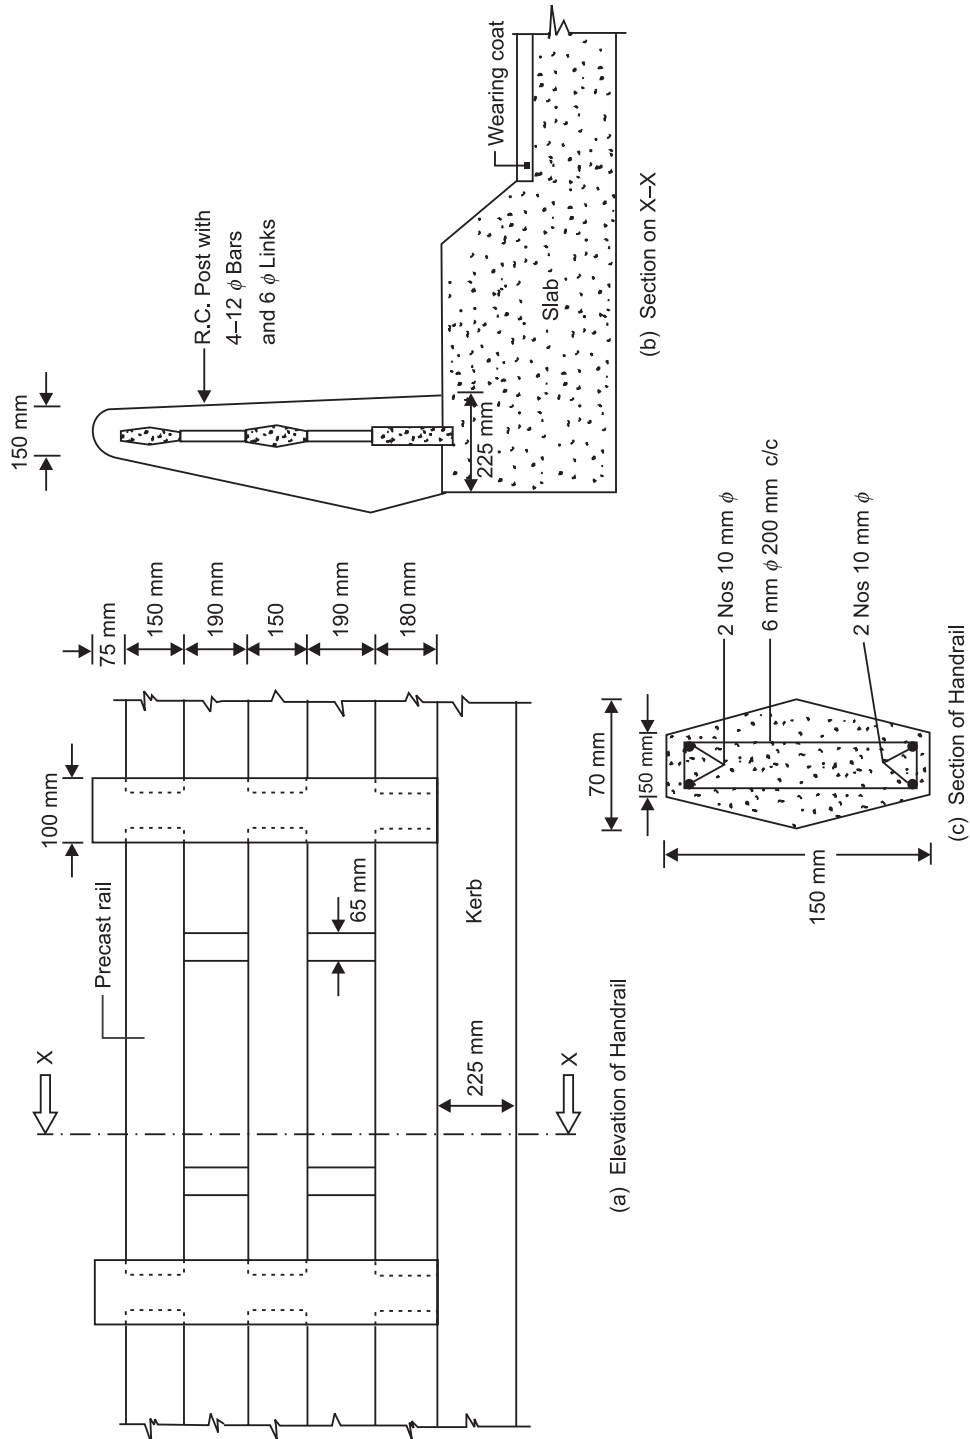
A Details of typical handrail for road bridges (Example 7.1).
